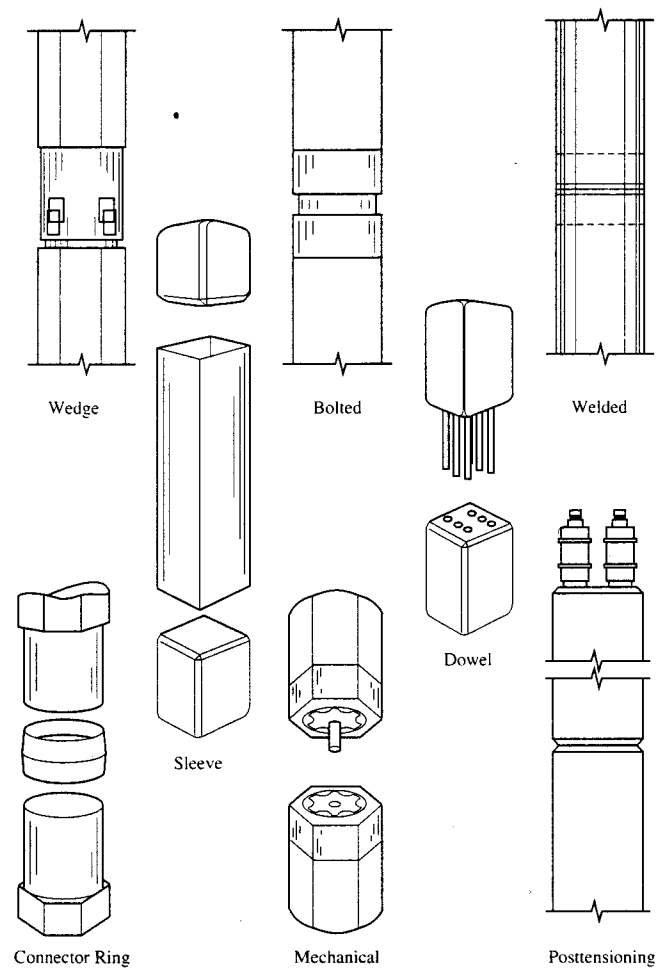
Typical splices for concrete piles (Precast/Prestressed Concrete Institute).
